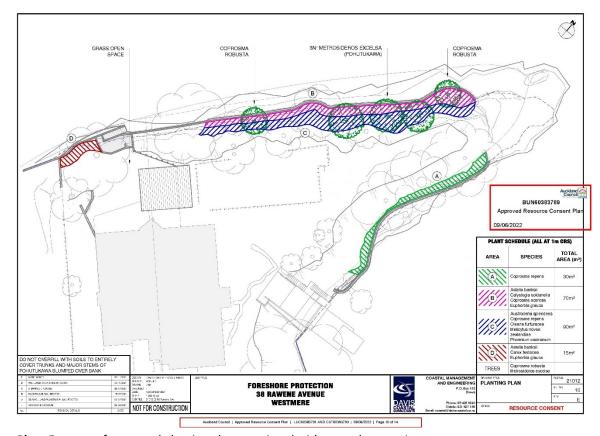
copy of approved planting plan associated with coastal protection structures resource consents.
